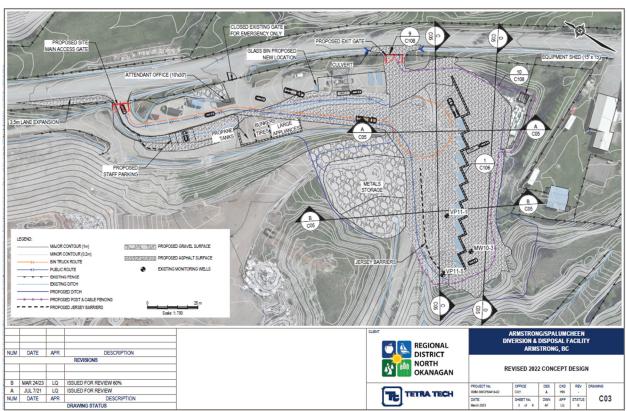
Proposed design layout for the Armstrong/Spallumcheen Transfer Station
